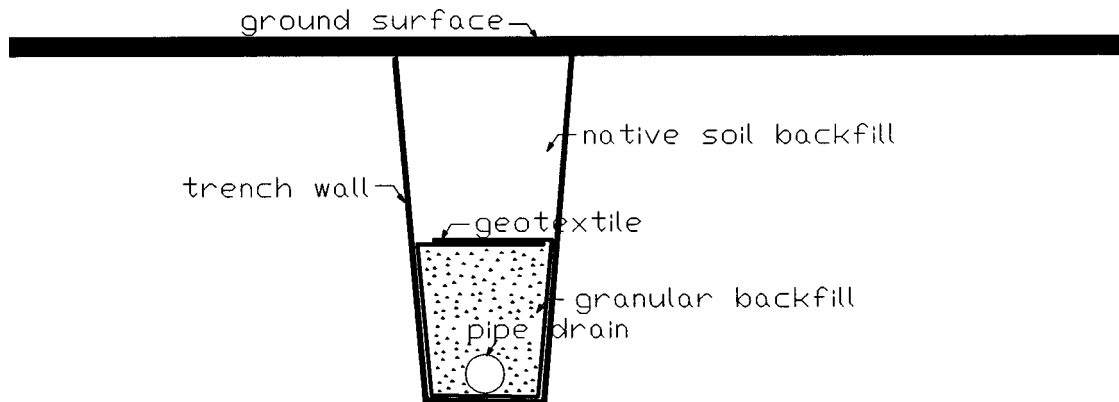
Schematic showing use of geotextile to stabilize trench subgrade and walls
